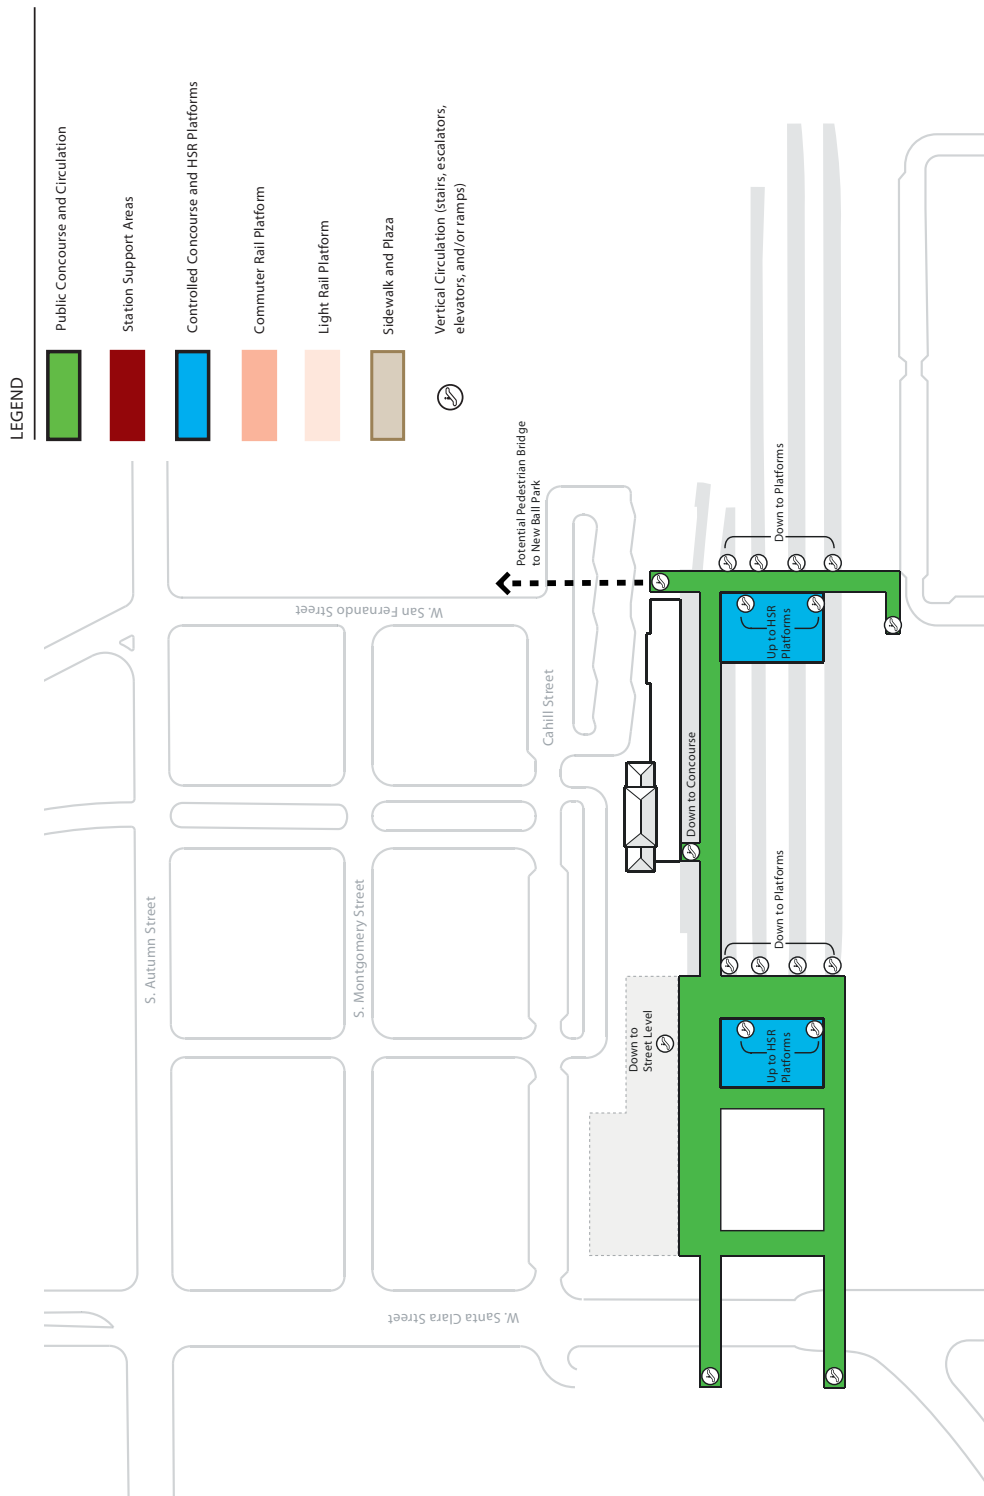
HIGH SPEED PLATFORM LEVEL PLAN
